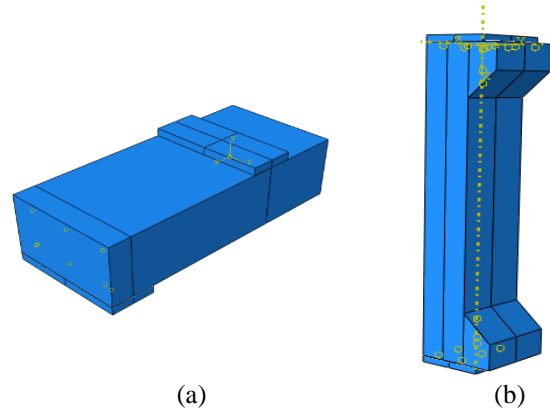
The typical geometry of the FE models of (a) concrete beams, (b) eccentrically loaded columns
